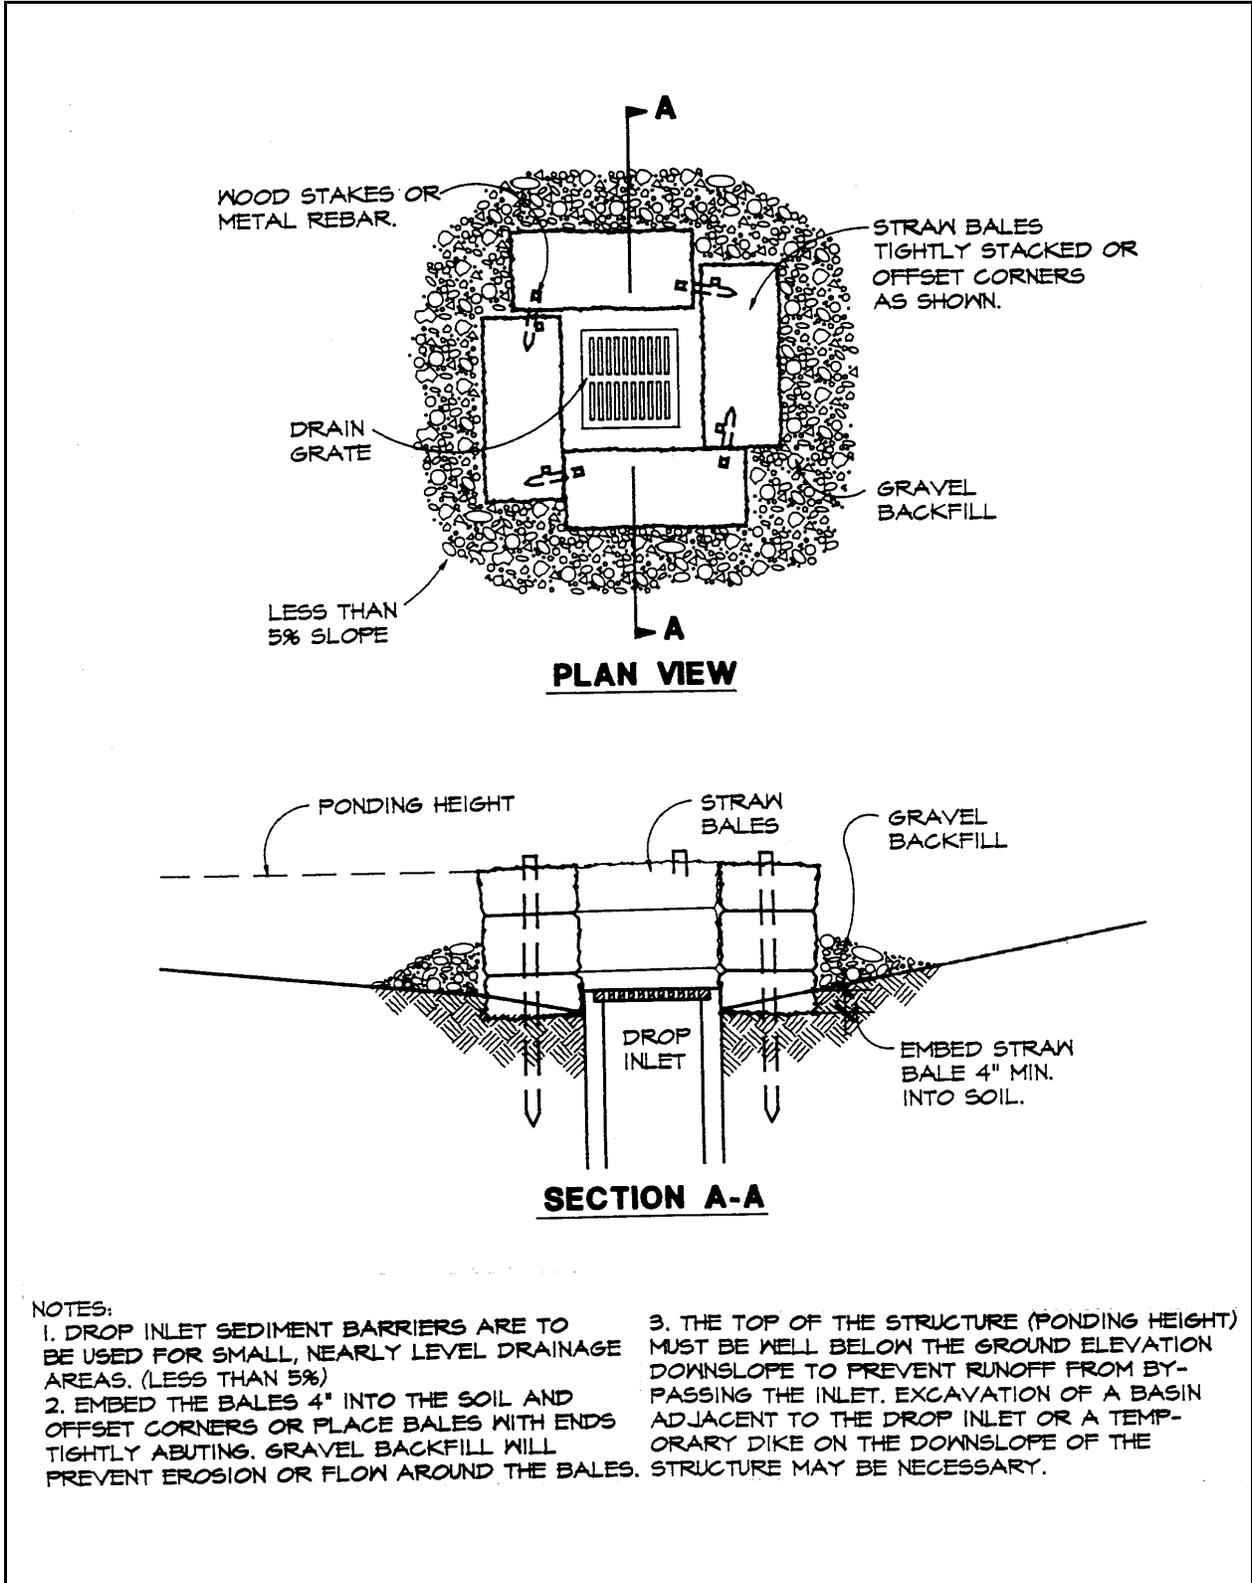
Straw Bale and Gravel Drop Inlet Sediment Barrier
